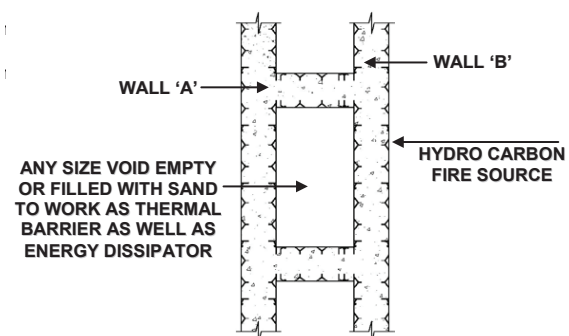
DINCEL DIAPHRAGM WALL PLAN
